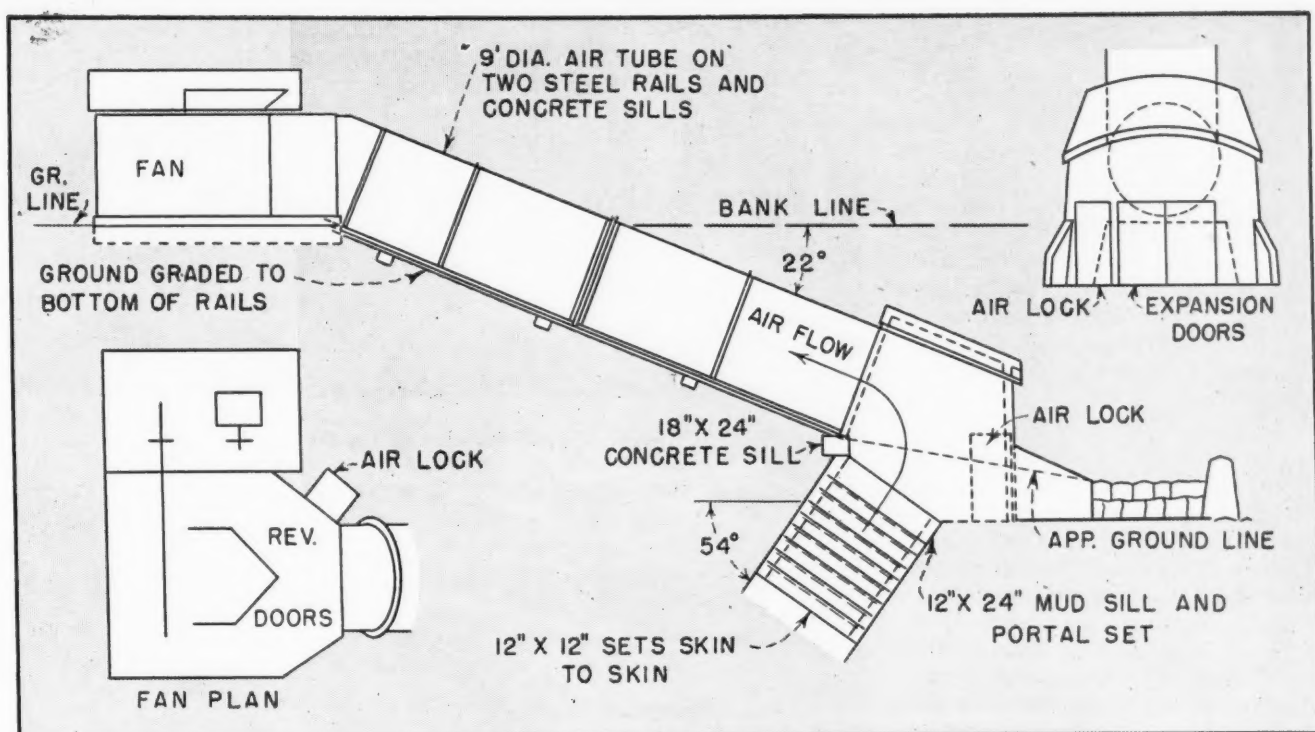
FAN LAYOUT and connection to new air slope 335 ft. long and inclined 54 deg. from the horizontal. Easy access to the fan and equipment in case of necessity is a major feature of this installation.
